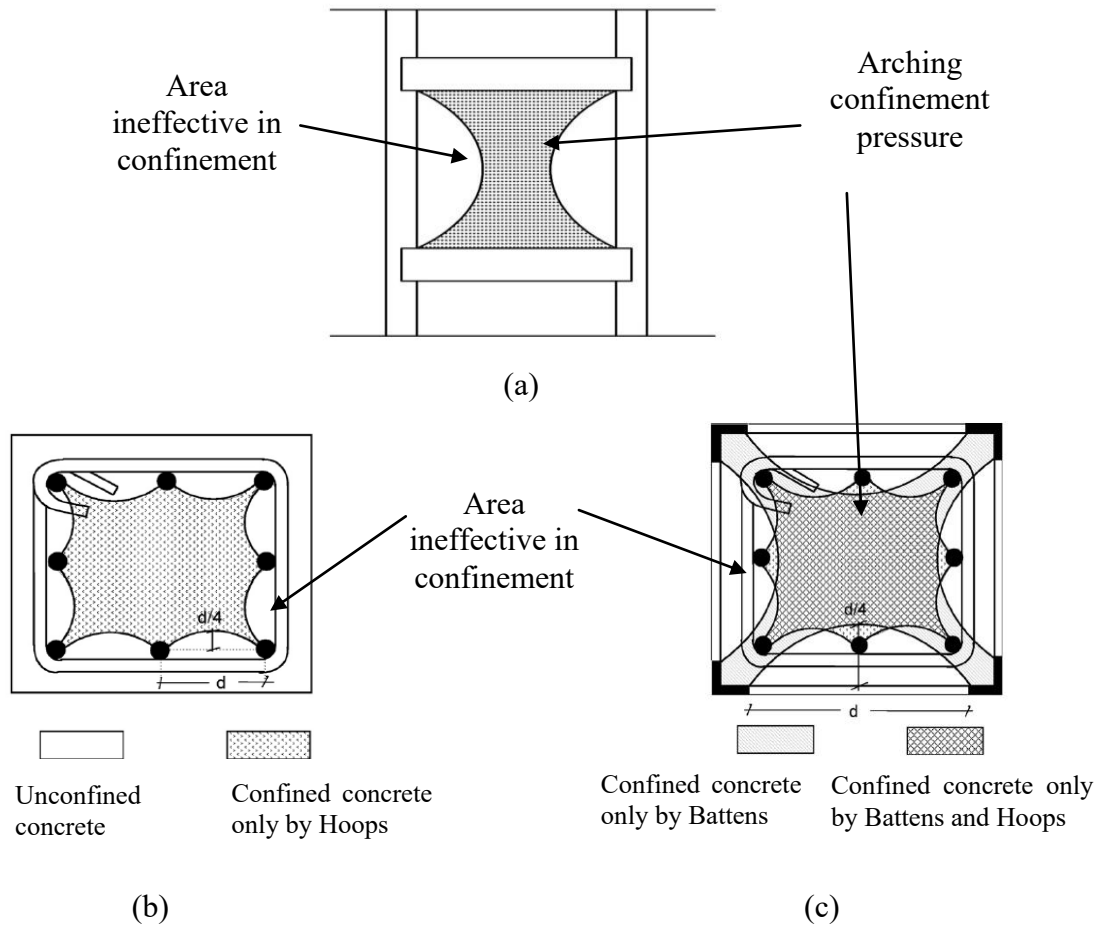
RC column strengthened by steel jacking with angles and strips
